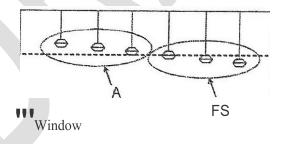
Figure A: Elevation view showing an application of indoor lighting, labeled 'FS,' which is subject to these requirements and indoor lighting, labeled 'A,' which is installed so that it is typically not subject to these requirements.
